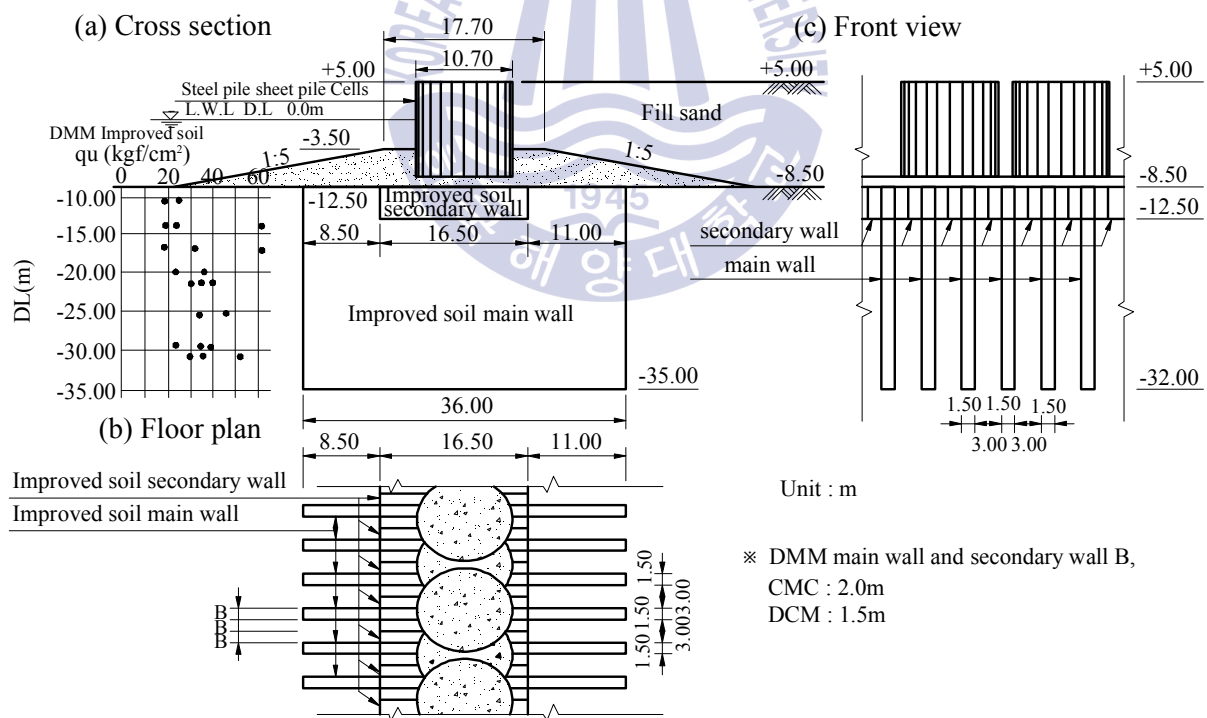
Revetment structure drawing of intermediate partition (Tokyo Bay offshore waste landfill site)
